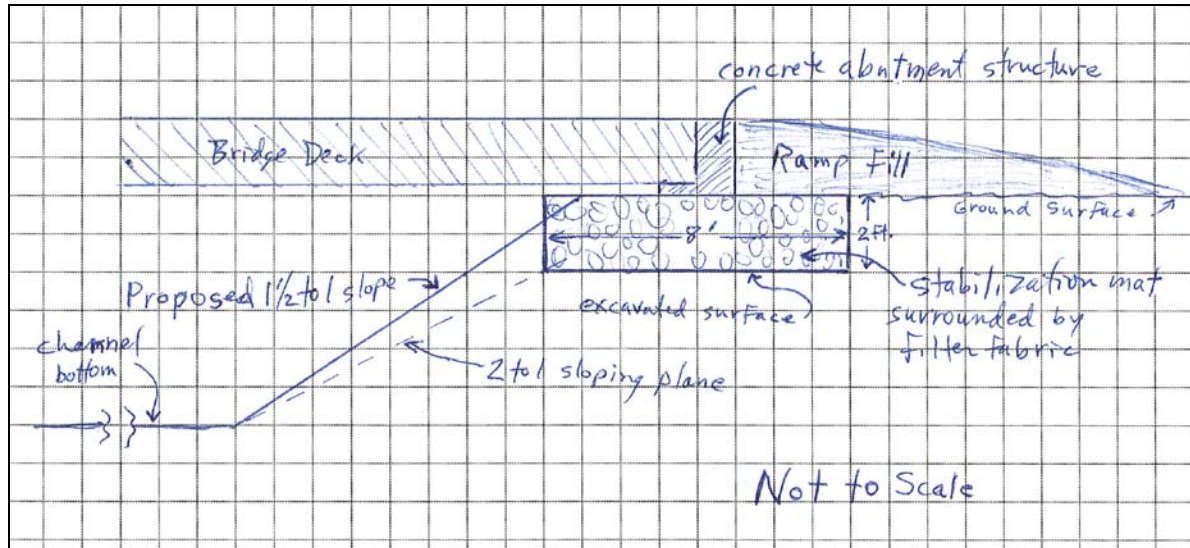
Schematic Drawing of Foundation System for Bridges with Spans Greater Than 30 feet
